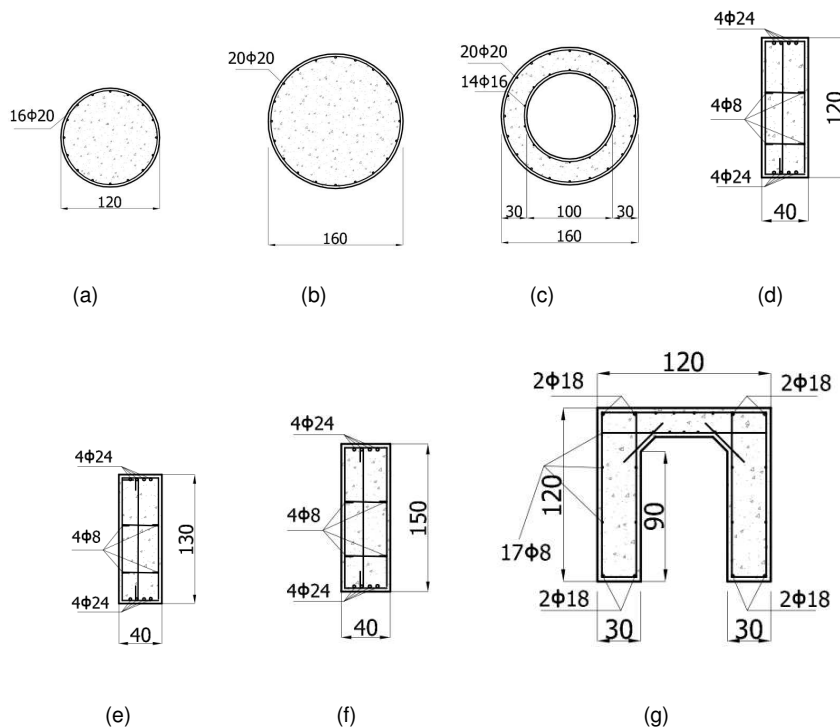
Full-scale cross sections of piers elements: a) circular cross section 120 cm diameter; b) circular cross section 160 cm diameter; c) hollow circular section; d) transverse beam 120 cm high; e) transverse beam 130 cm high; f) transverse beam 150 cm high; g) cap beam section.
